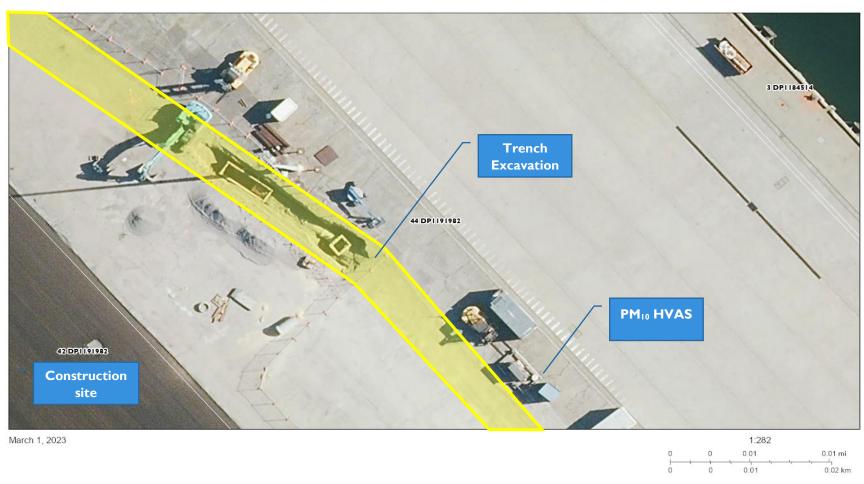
Trench Excavation in Close Proximity to PM₁₀ HVAS
